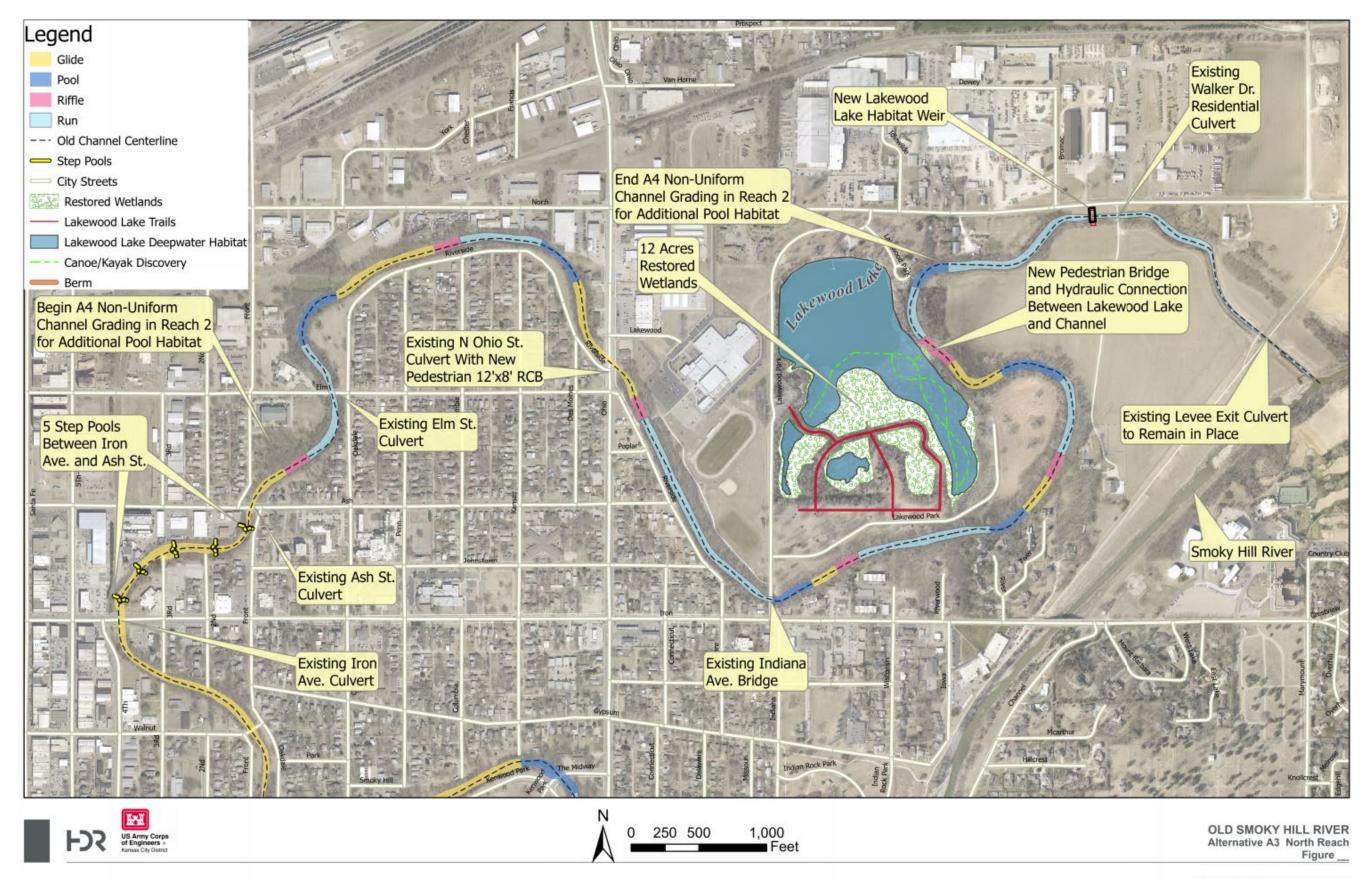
Alternative A3Non-Uniform Channel Grading Plan View Layout (Reach 2)
